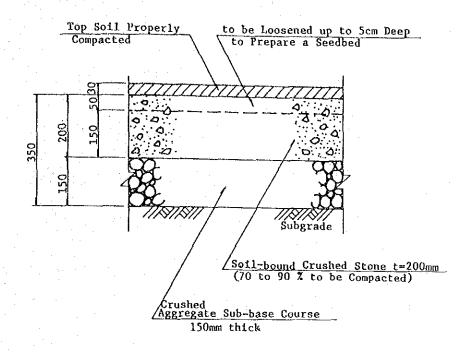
Pavement Structure of Aggregate-Turf
